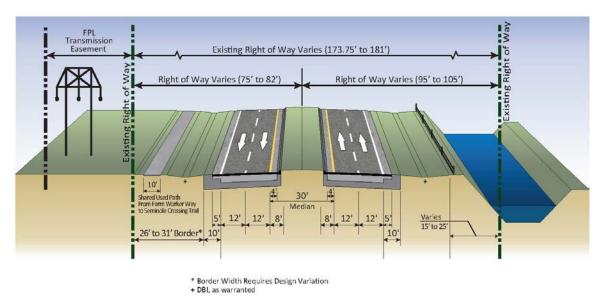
SR 29 Typical Section from South of Kaicasa Entrance to North of Seminole Crossing Trail
